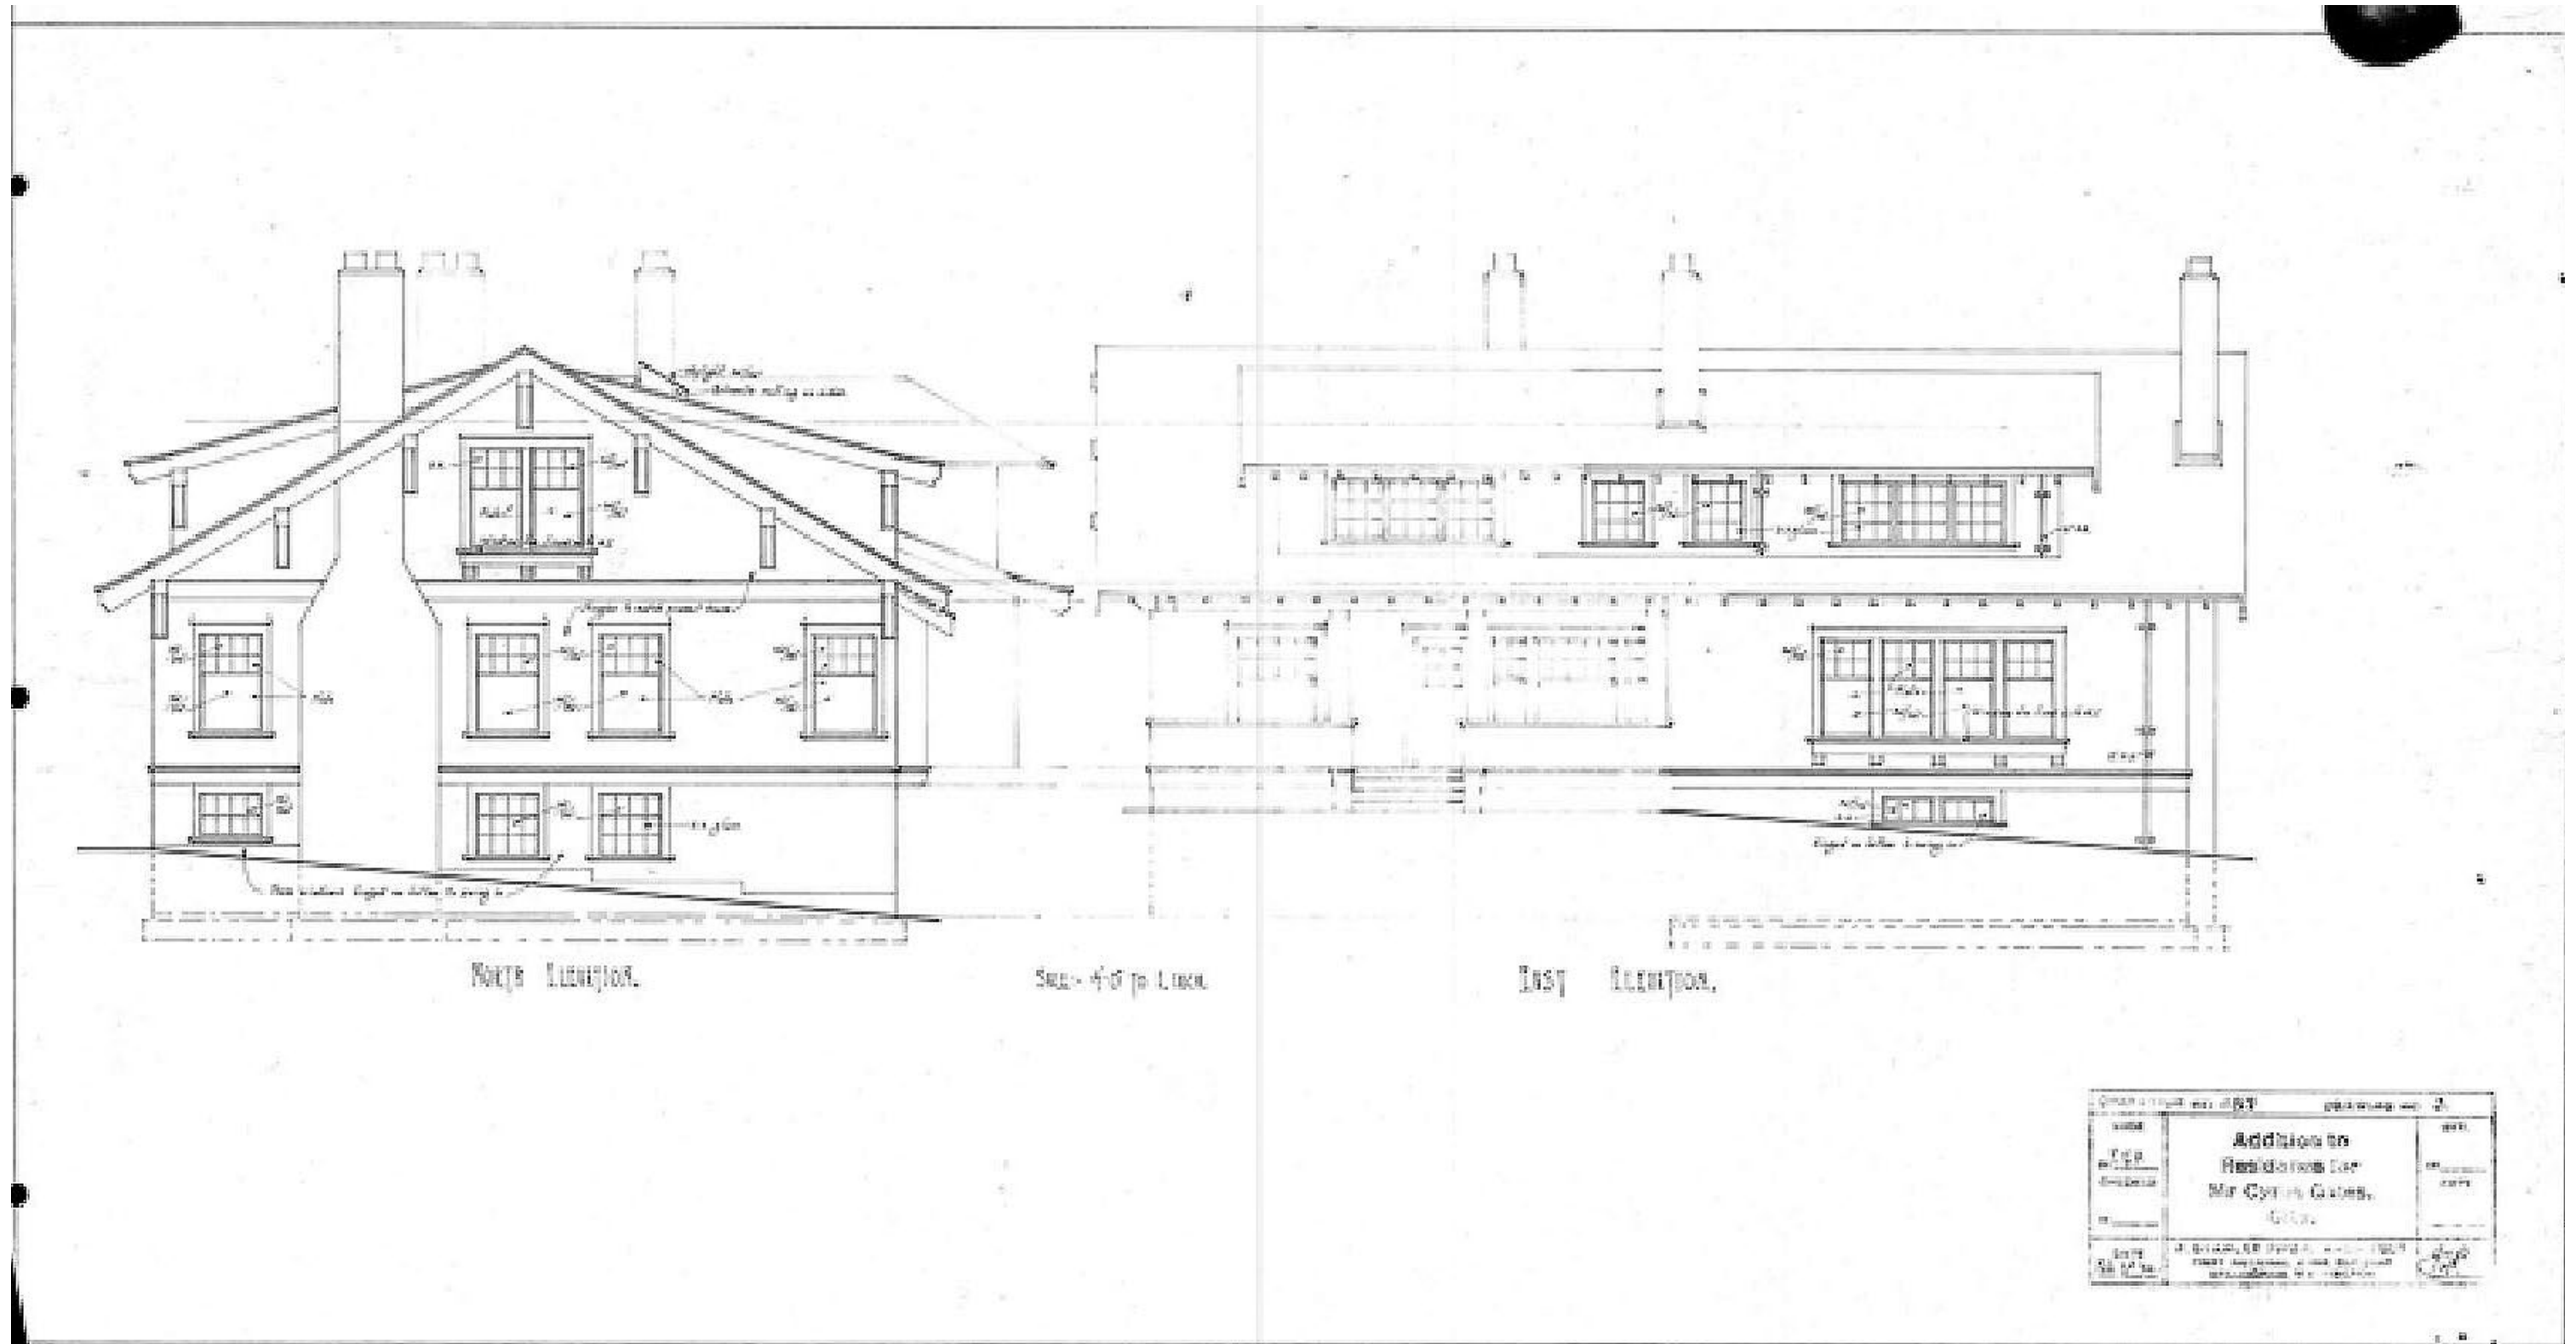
Drawing No. 3: North [Exterior] Elevation (left) and East [Exterior] Elevation (right), dated 3/3/1922. (Courtesy Tim Wahl collection, citations available.)
